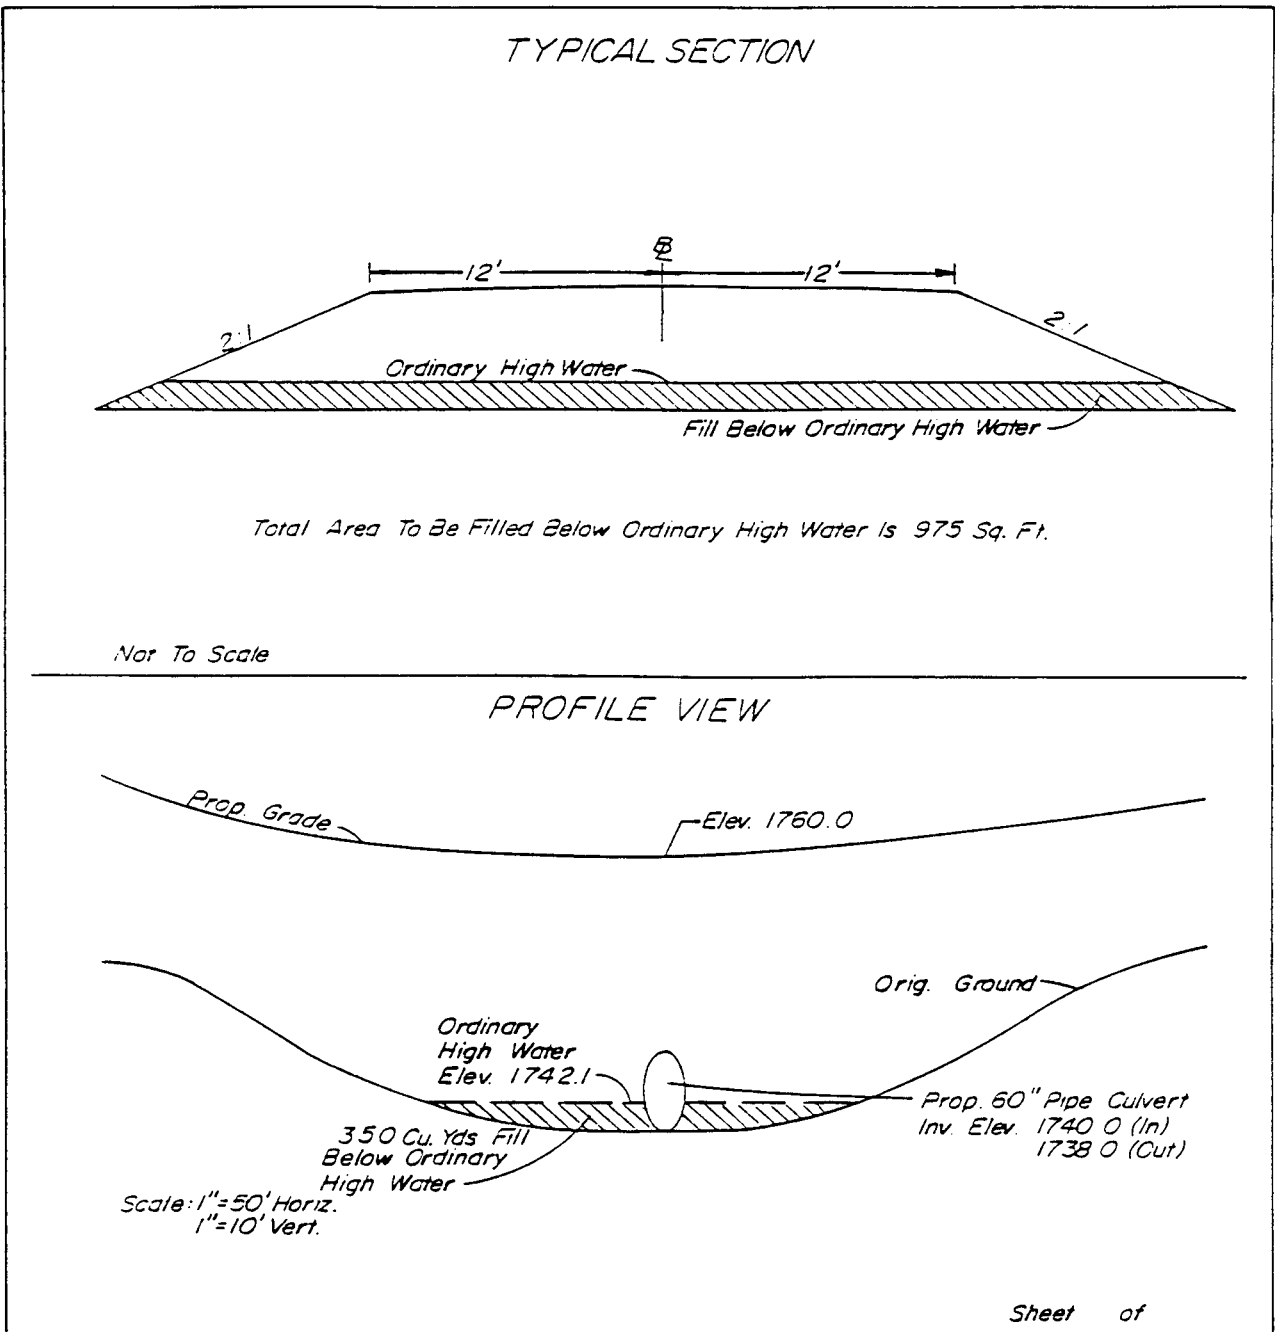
CULVERT (NON-TIDAL) -TYPICAL SECTION AND PROFILE VIEW
